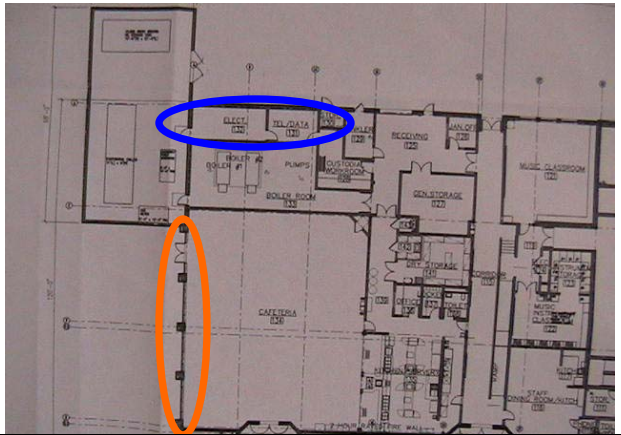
Building plan showing mansard roof (orange) in proximity to electrical and data room (blue)
